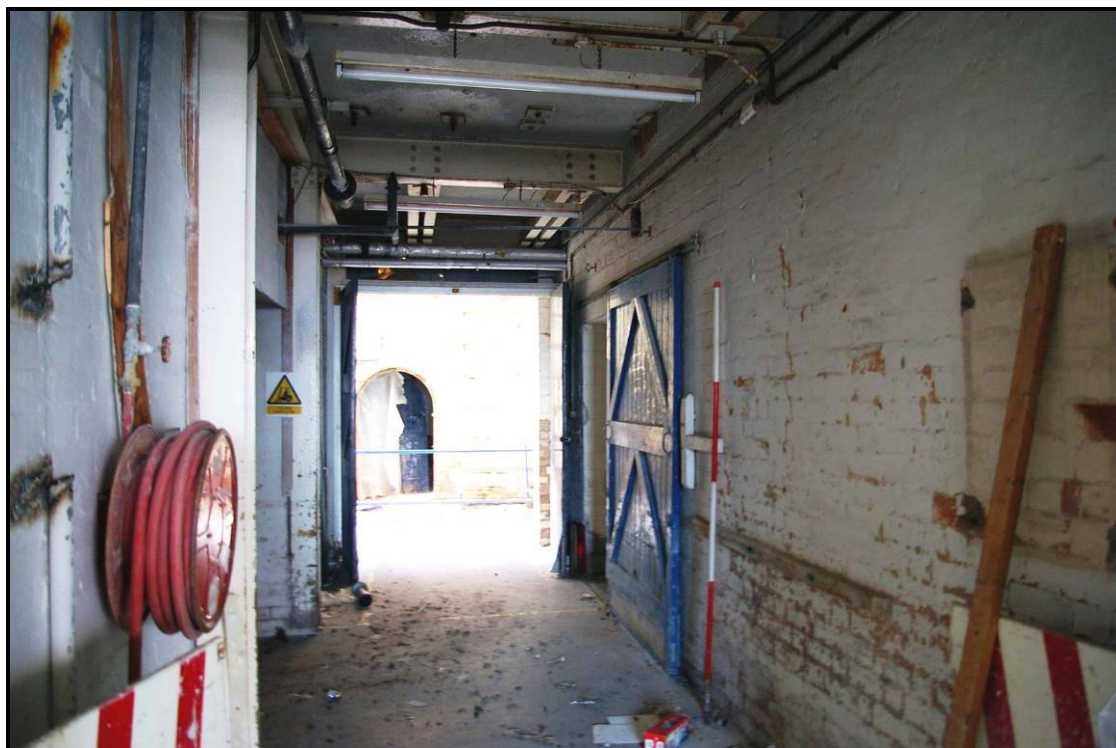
The passageway, looking south towards the Bone Mill (Building D)
